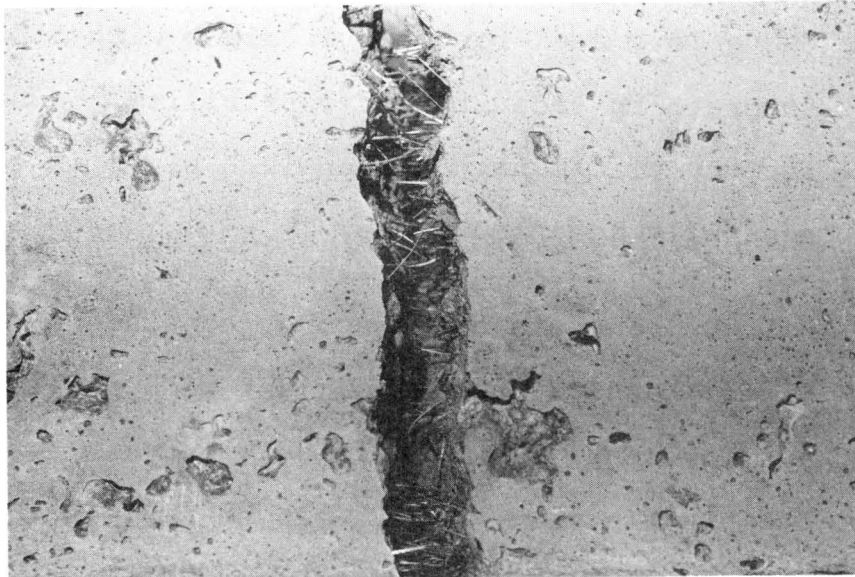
A close-up of the fracture in the fibrous concrete beam. These fibers held the crack closed until additional load was applied to break the bond.
